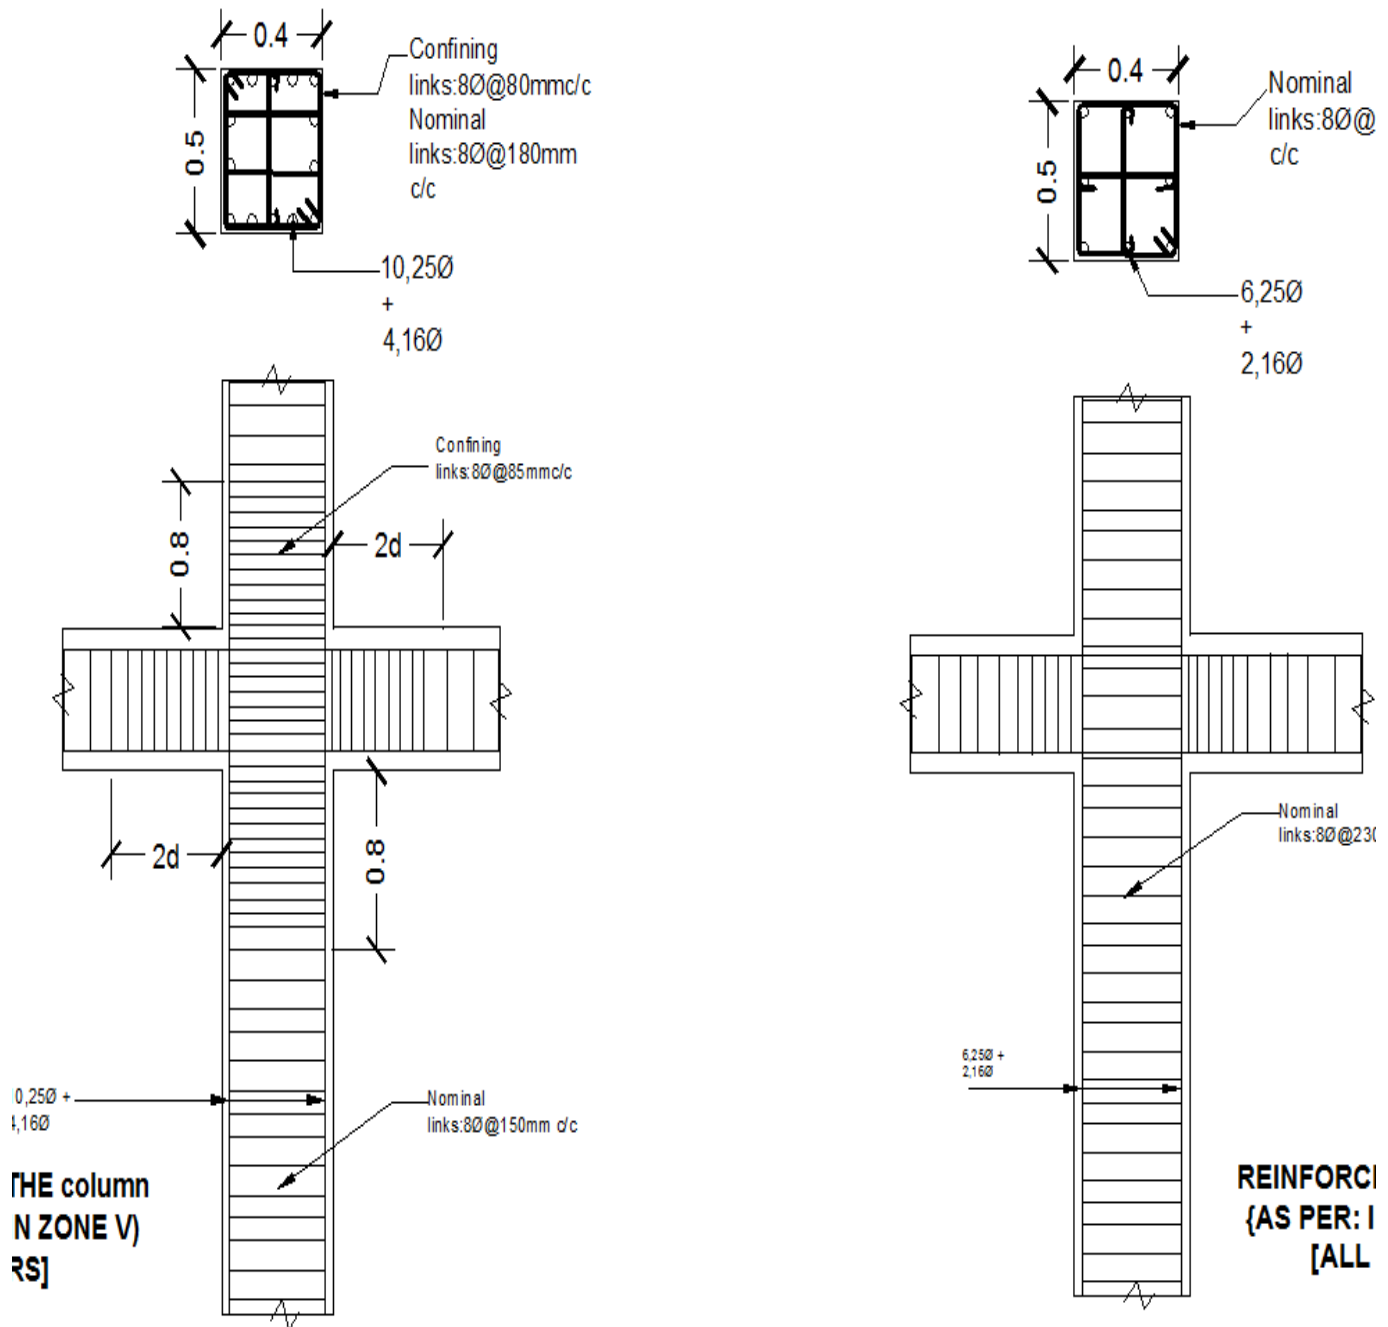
steel reinforcement detailing for an interior column of the building seismic zone V and zone II
